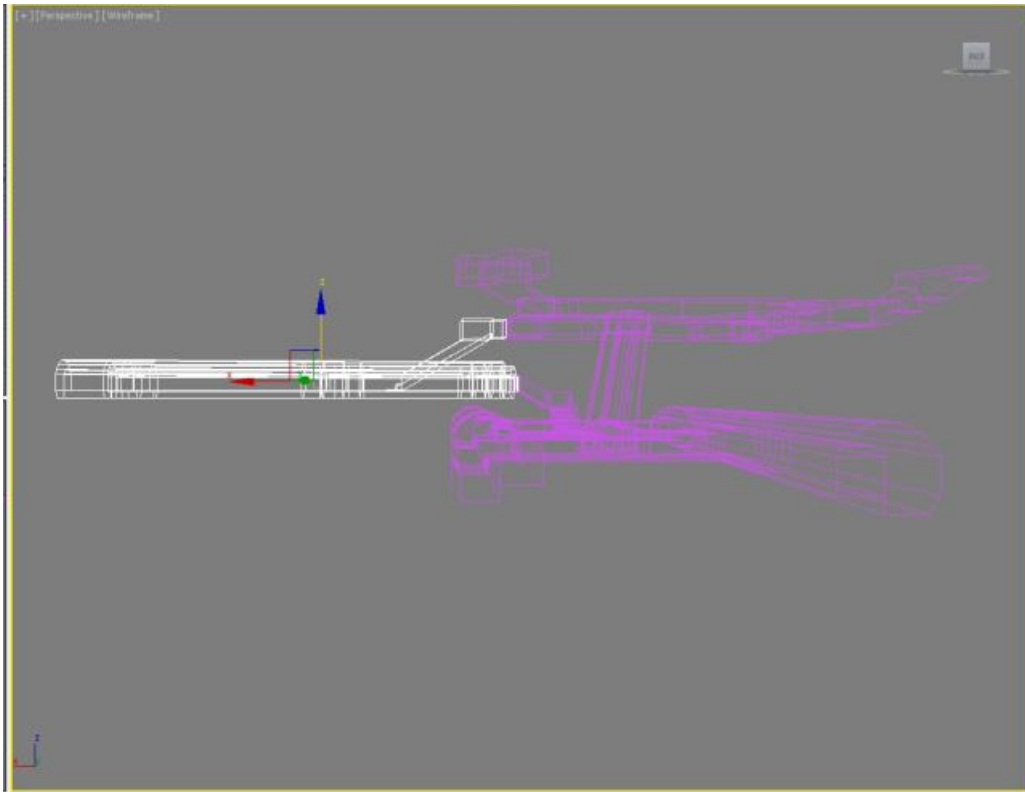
Polygon frame model of the whole station highlight (white) EW tunnel (side elevation)
